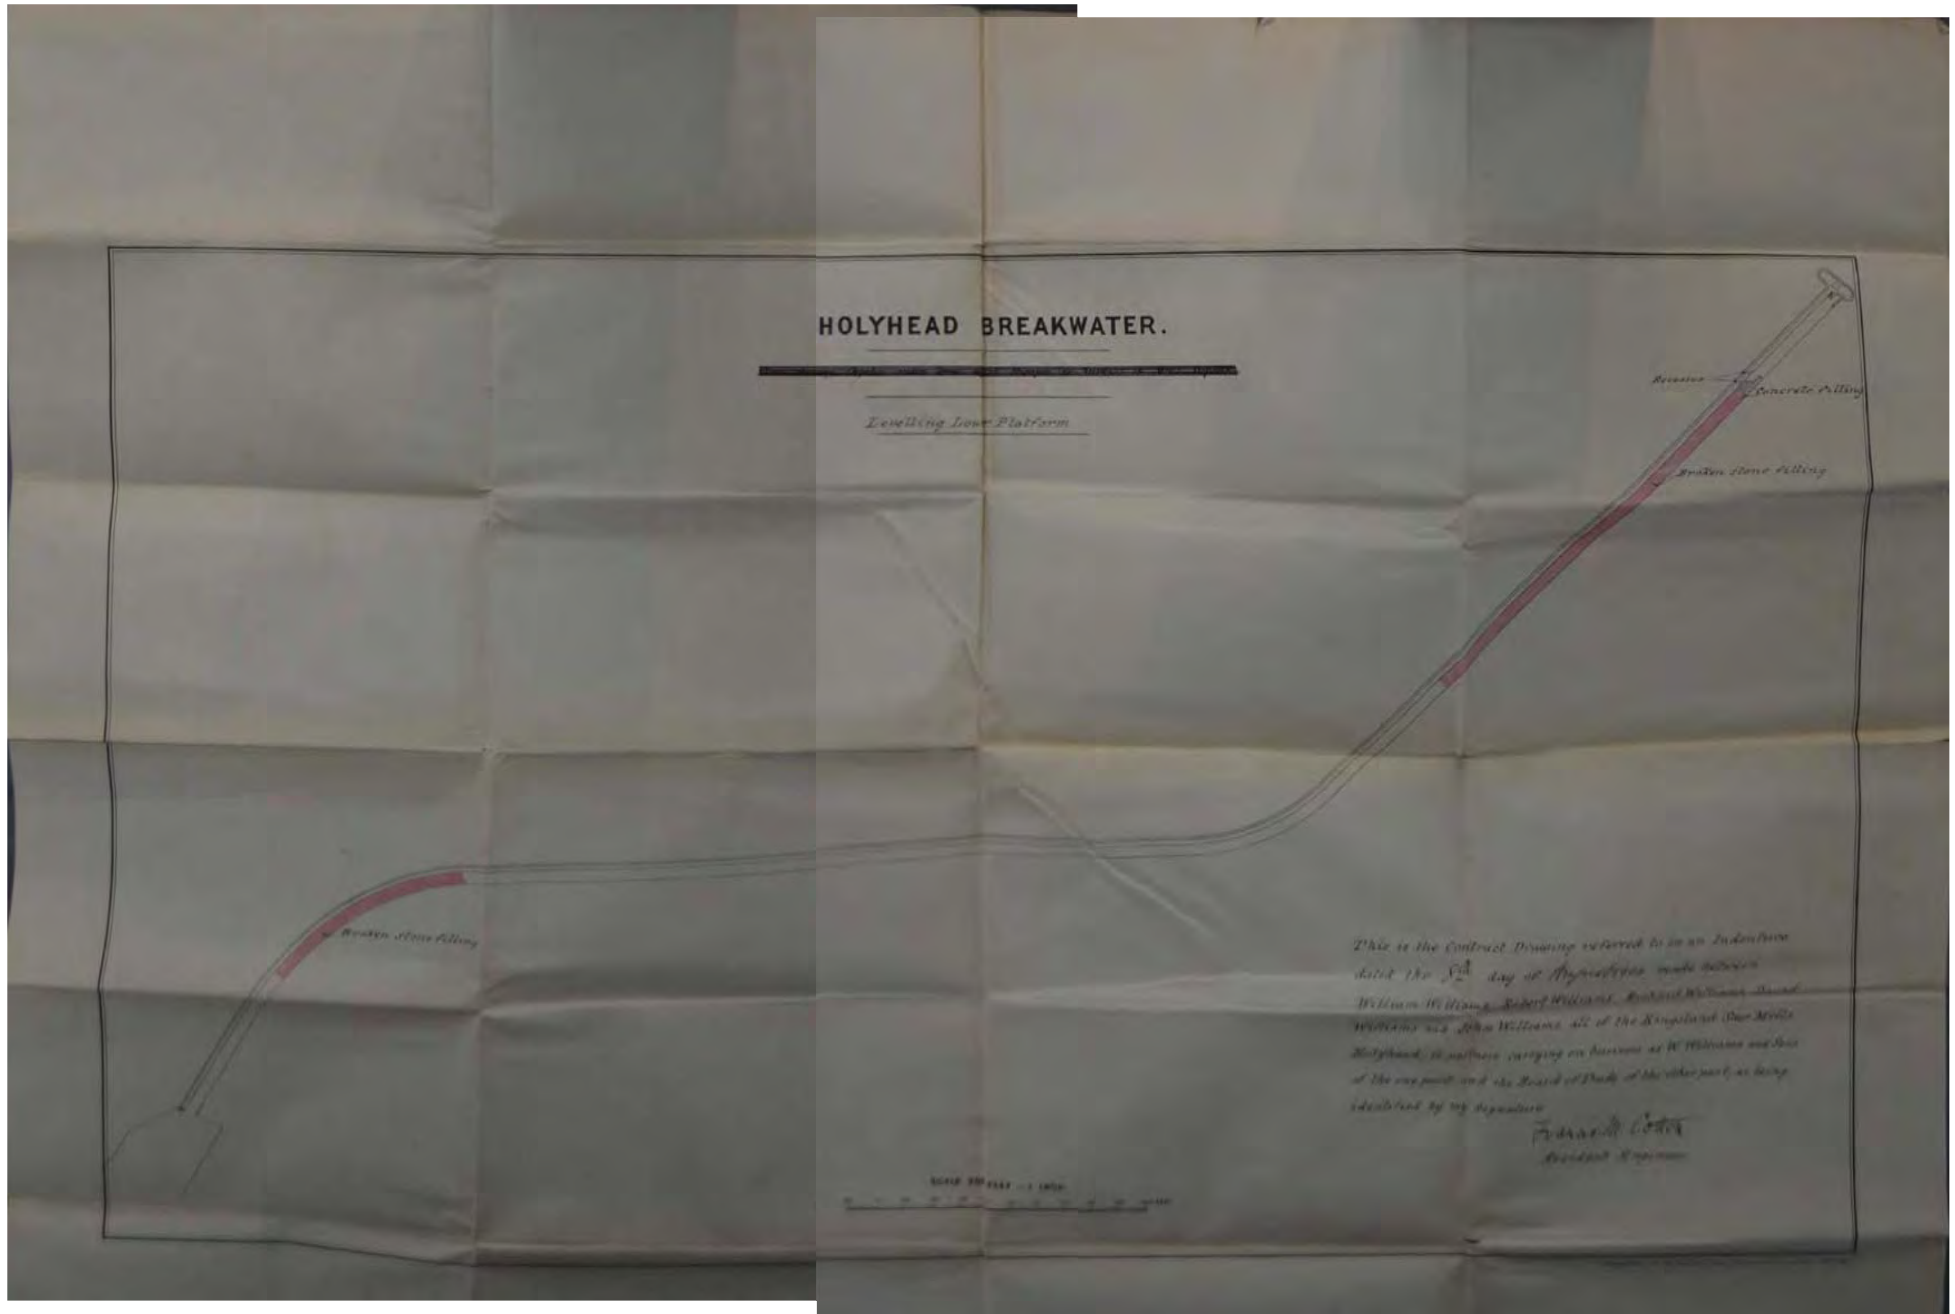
Plan showing area to be repaired of the Holyhead Breakwater in 1904 (National Archives, RAIL 837/8).
